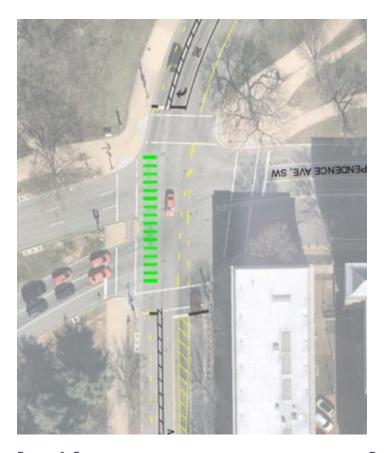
CONCEPTUAL PLAN FOR CYCLETRACK AT INTERSECTION OF RAOUL WALLENBERG DRIVE AND INDEPENDENCE AVENUE (Nelson\Nygaard, 2020).
